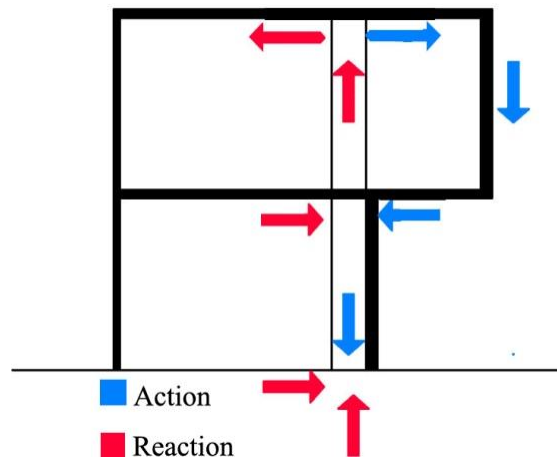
Forces diagram in a building façade and a multi-angled façade unit connected to it according to scenario 3
